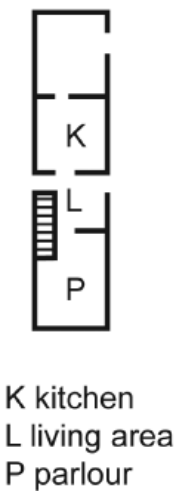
Ground floor plan of an English seventeenth-century house.
